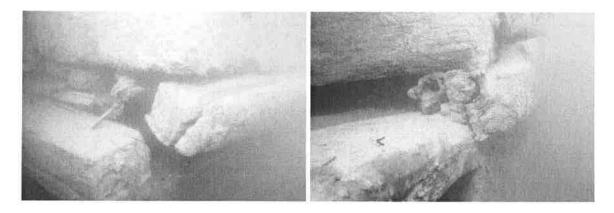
Failing and displaced timber crib members supporting a 3-foot concrete cap.
